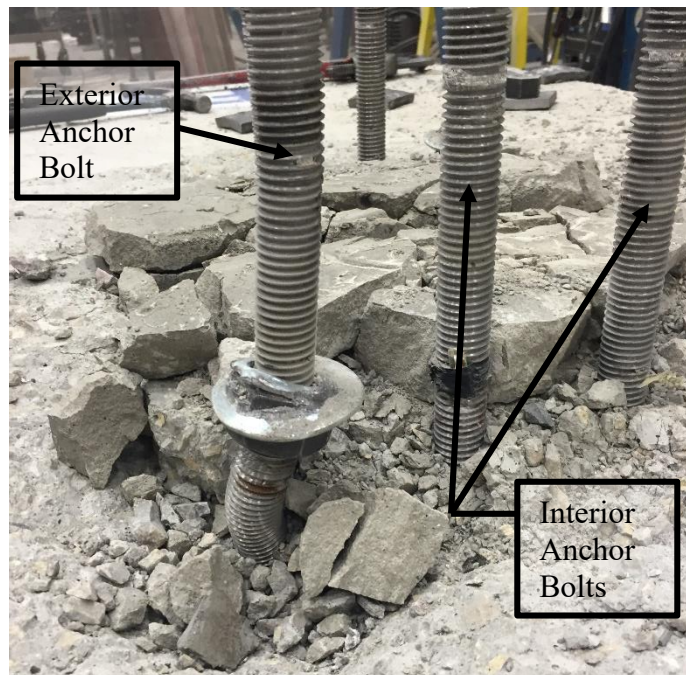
Anchor Bolts Post Test, Specimen D2
